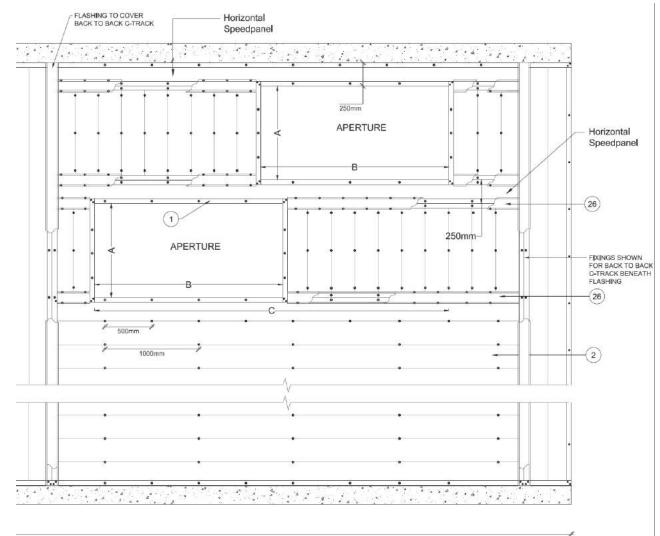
Typical Vertical Speedpanel wall with greater than 600mm vertical and horizontal infill.
